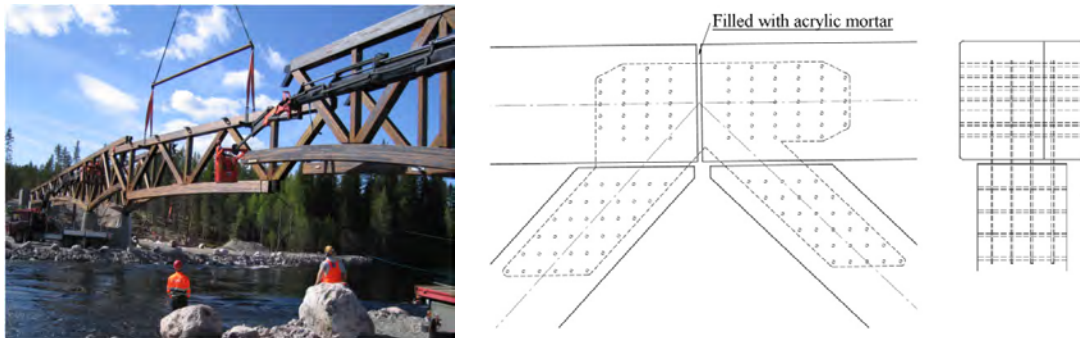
Kjølssæter Bridge (2005), Norway, left: truss structure under assembly, centre and right: detail of connection at the top chord, source: Moelven Limtre AS and Sweco AS
